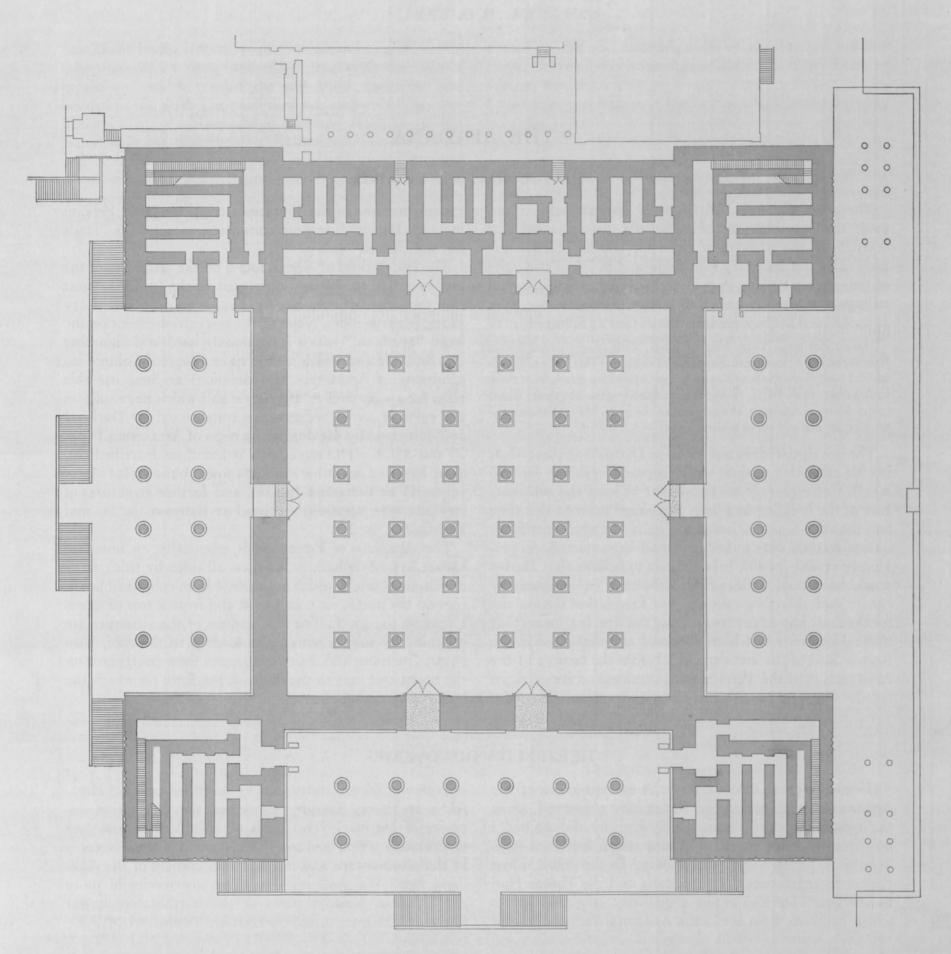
Reconstructed Plan of Apadana. Scale, 1:600
